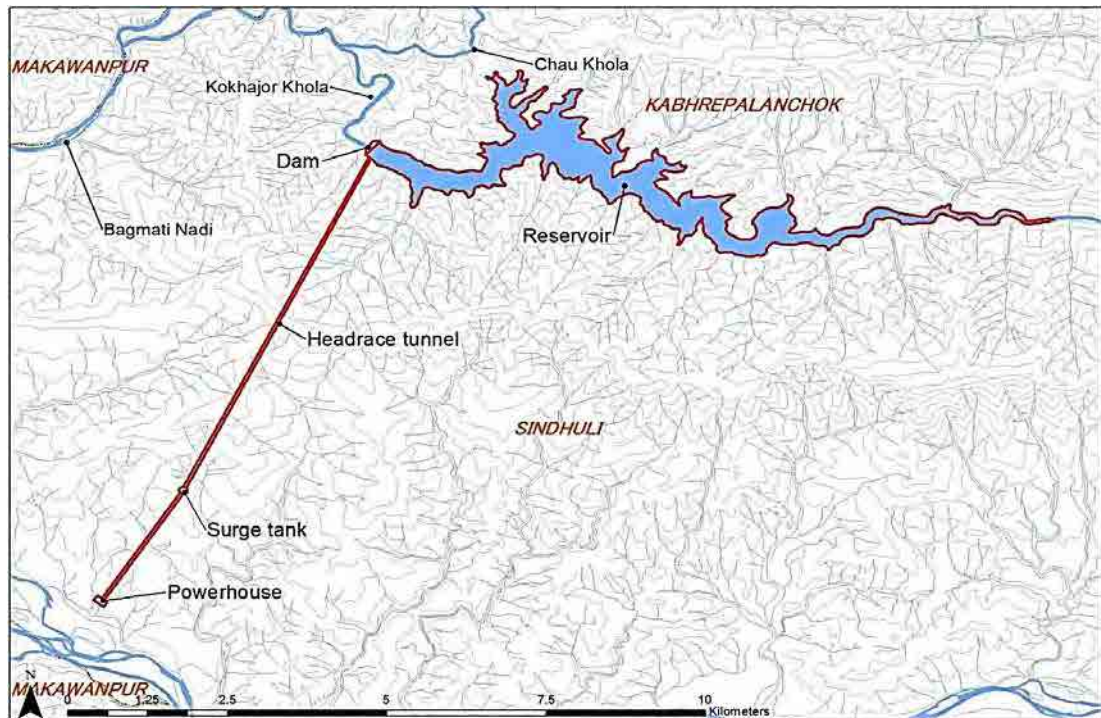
General Layout of the Kokhajor-1 Project (E-06)
